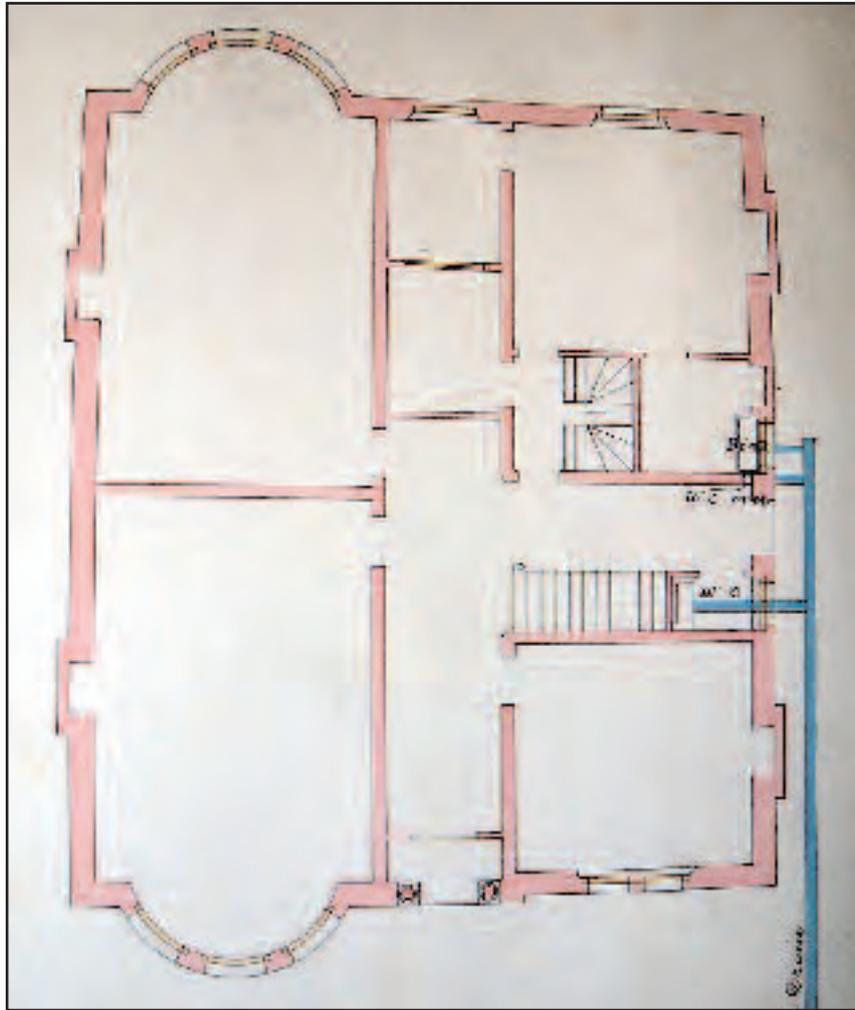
Ground floor plan of 10 & 11 Priory Road, 1872
